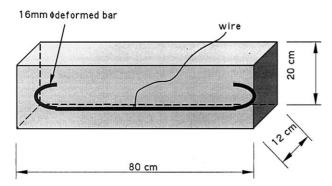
Singly reinforced concrete beam specimens (12 cm \times 20 cm \times 80 cm).
